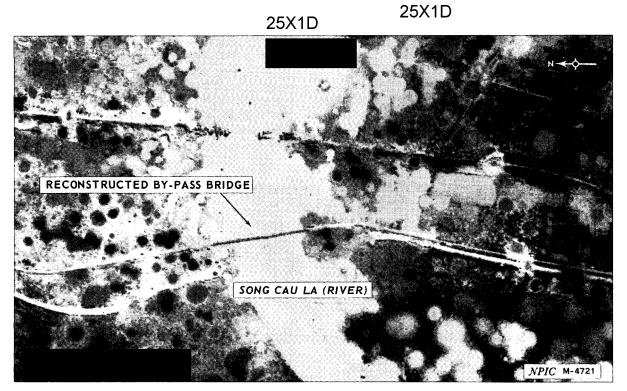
RECONSTRUCTION OF A RAIL BY-PASS BRIDGE, THANH HOA-VINH RAIL LINE, NORTH VIETNAM.
